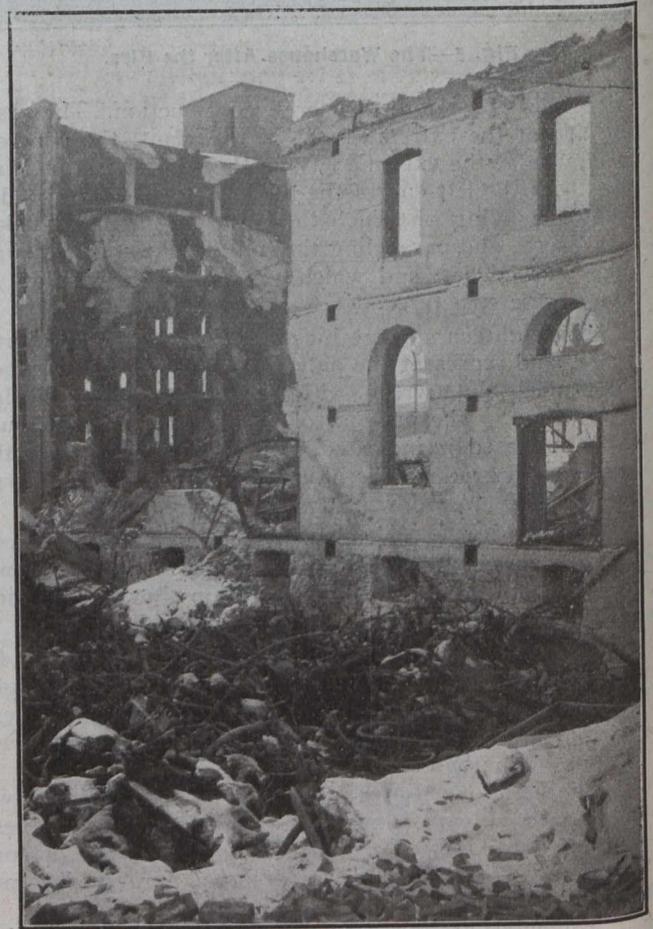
Another View of the Wrecked Structure. Wall in foreground belongs to another building.
